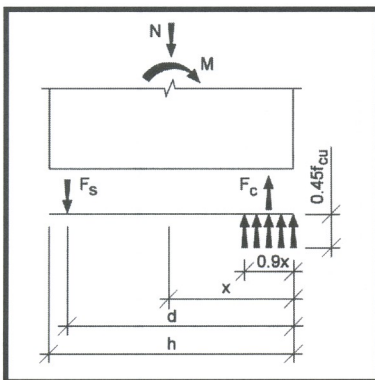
Design Principle Of Cantilever Precast Concrete Walls
